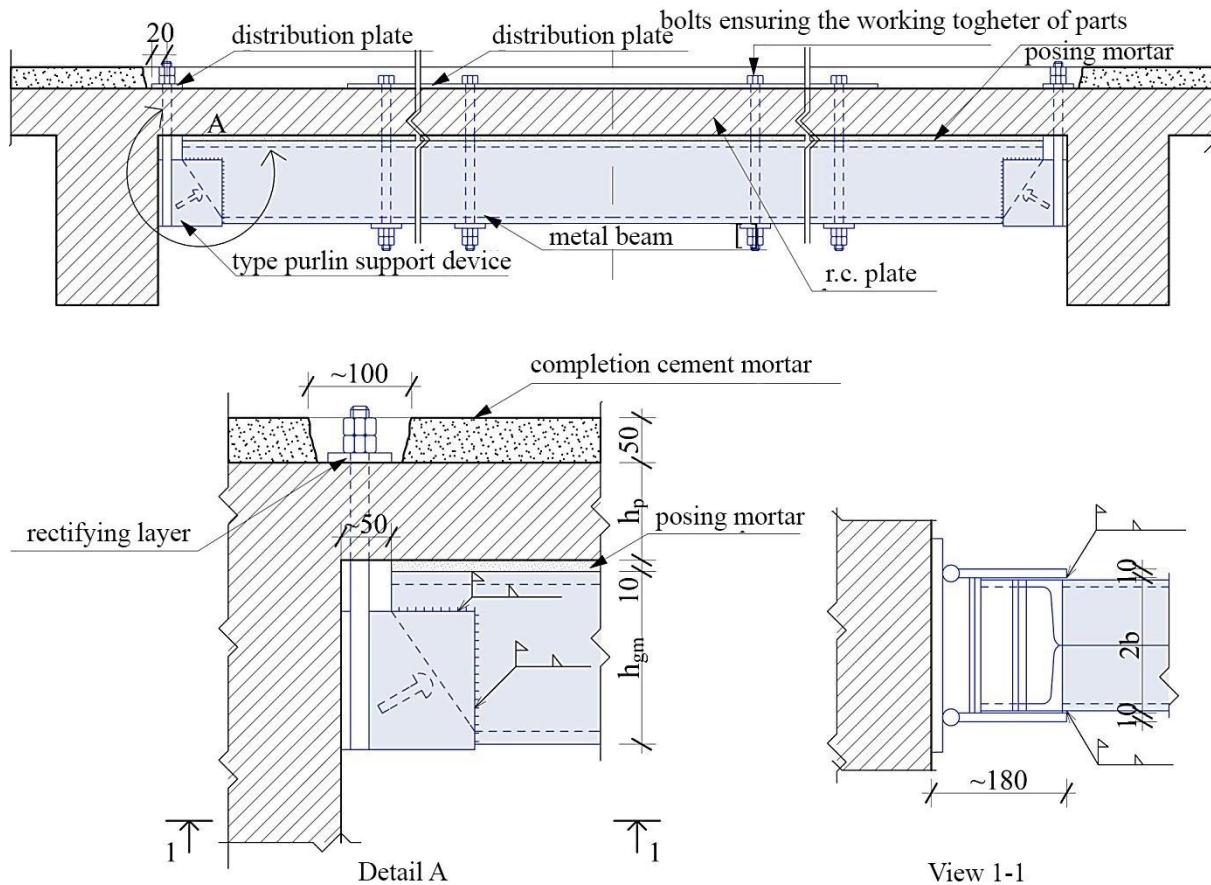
Strengthening of a reinforced concrete slab with rigid system
